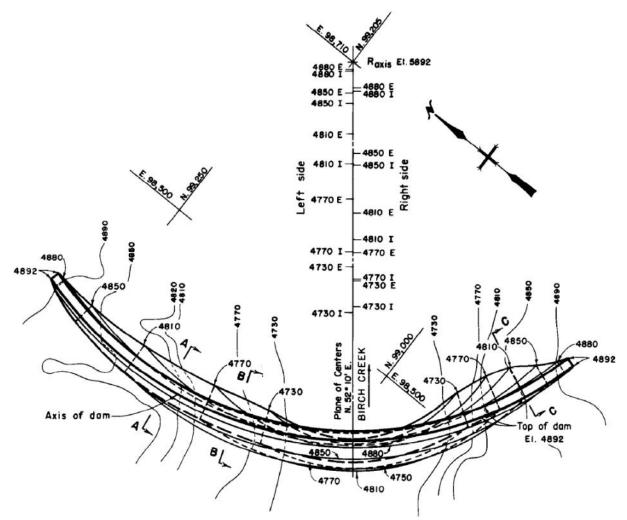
Layout drawing of a two planes of centers arch dam with variable-thickness arches in a nonsymmetrical canyon
